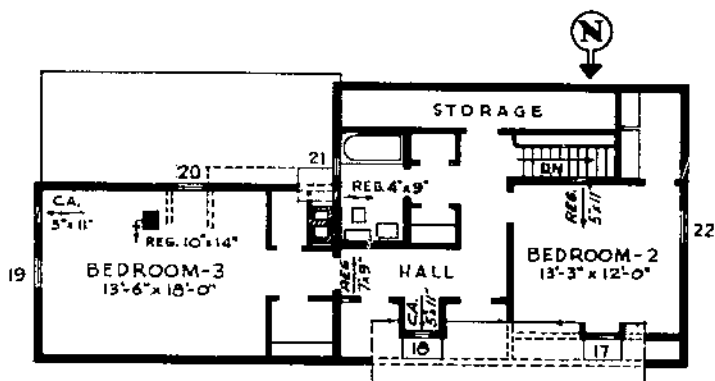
Second-floor plan of house No. 4-R, showing changes in room arrangement and locations of warm-air registers and cold-air returns.
